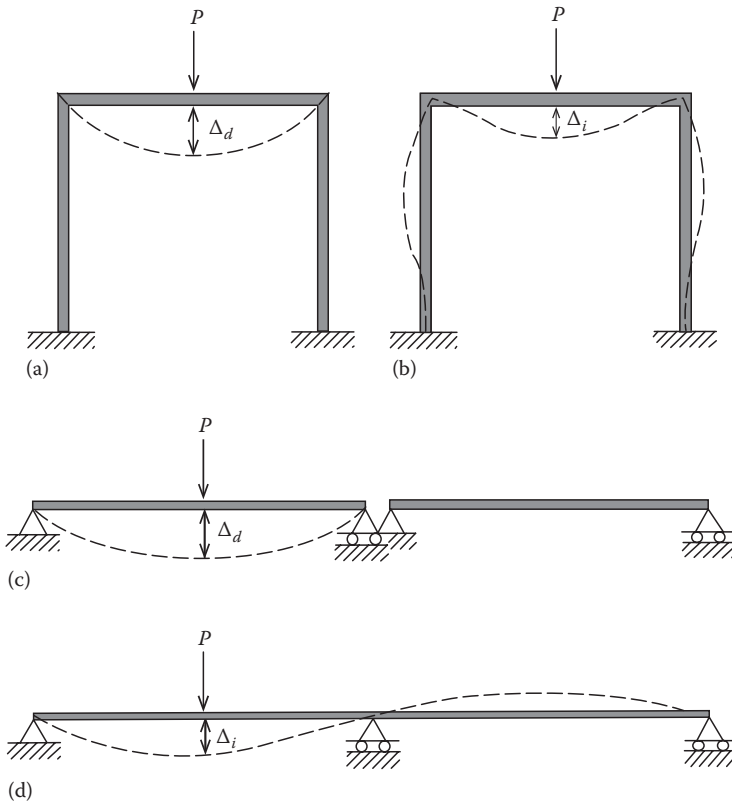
Comparative responses for statically determinate and indeterminate structures (a) post and lintel, (b) portal frame, (c) two simply supported beams, and (d) two-span continuous beam.
